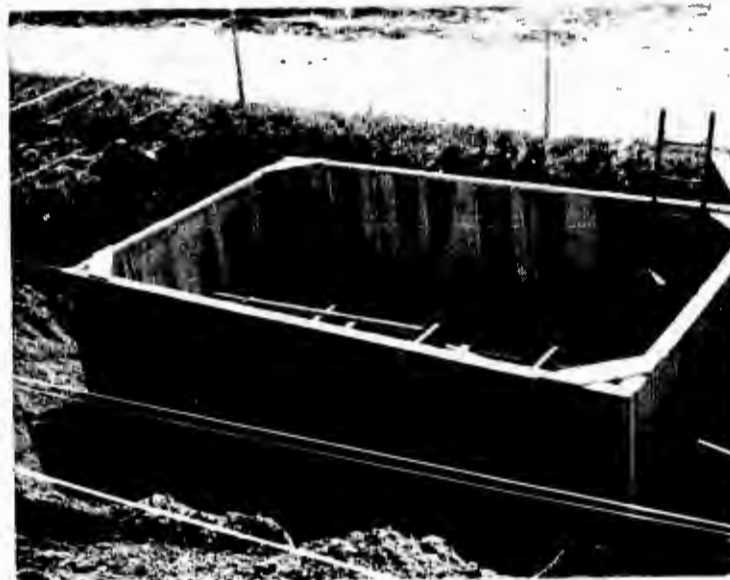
Four Hundred Foot Conduit Test - Middle Test Pit
